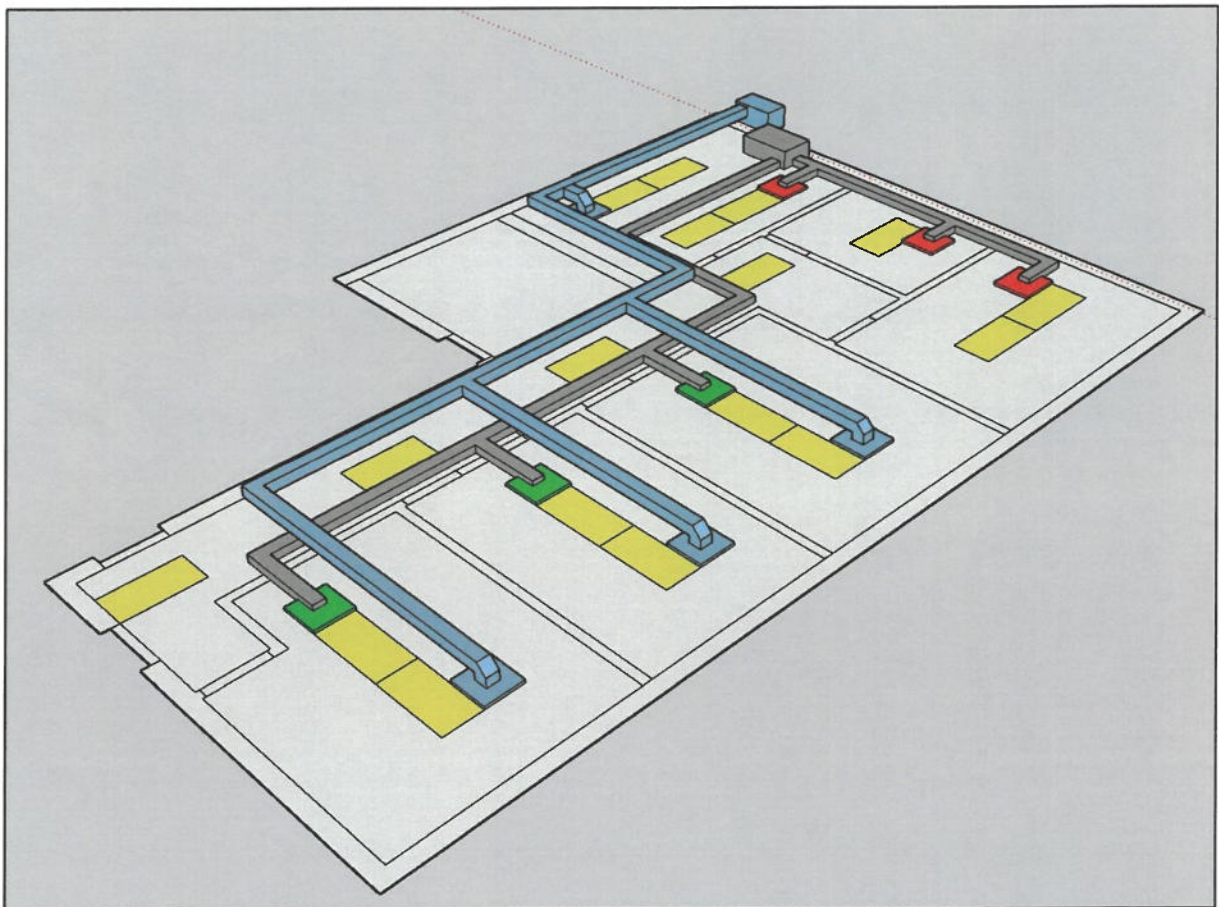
Recommended layout for HRV and Heat Pump ducts above office suite of Building 502 (Isometric View).
